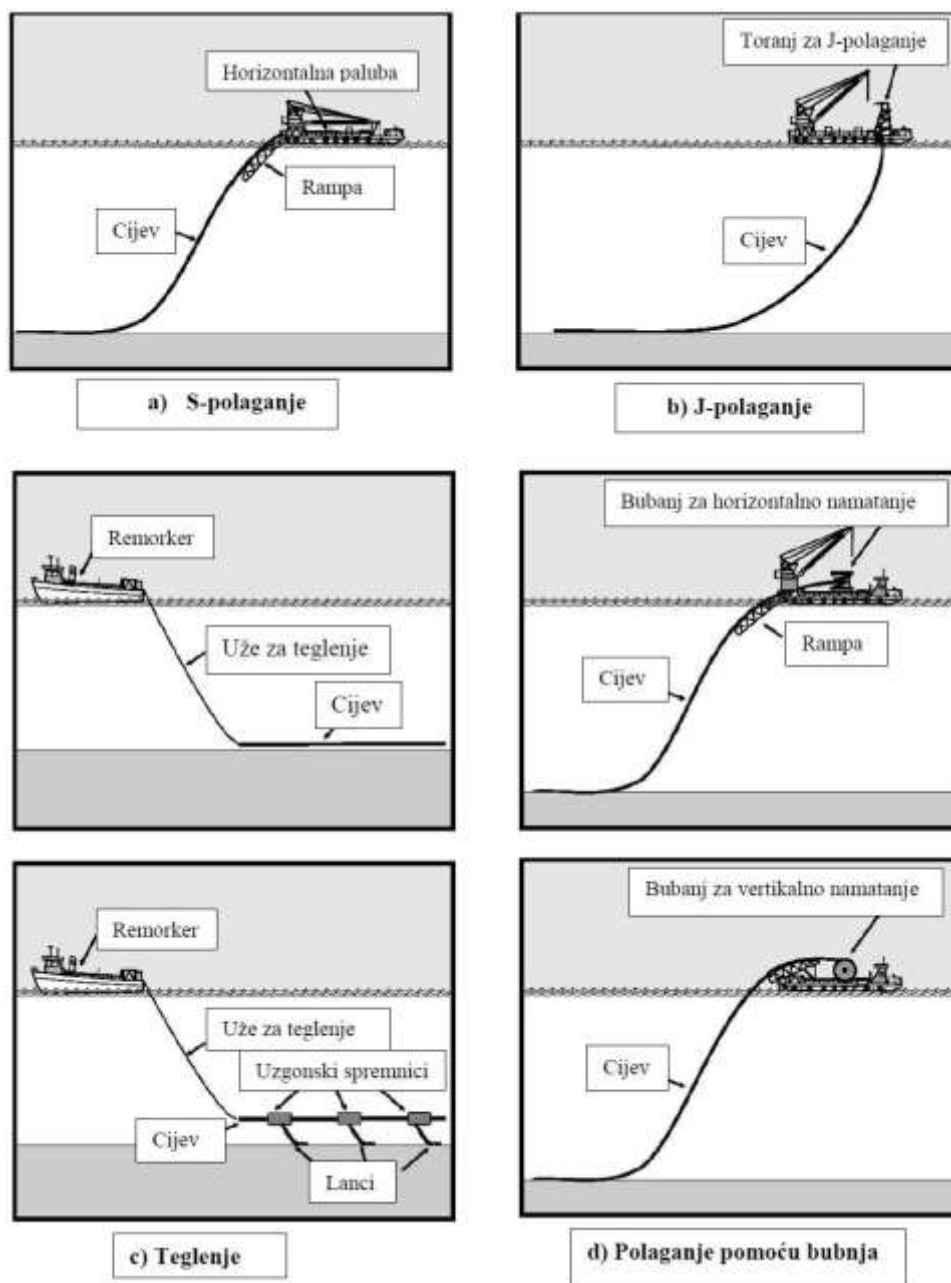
Examples of offshore pipe laying methods (source: Cranswick, 2001)
